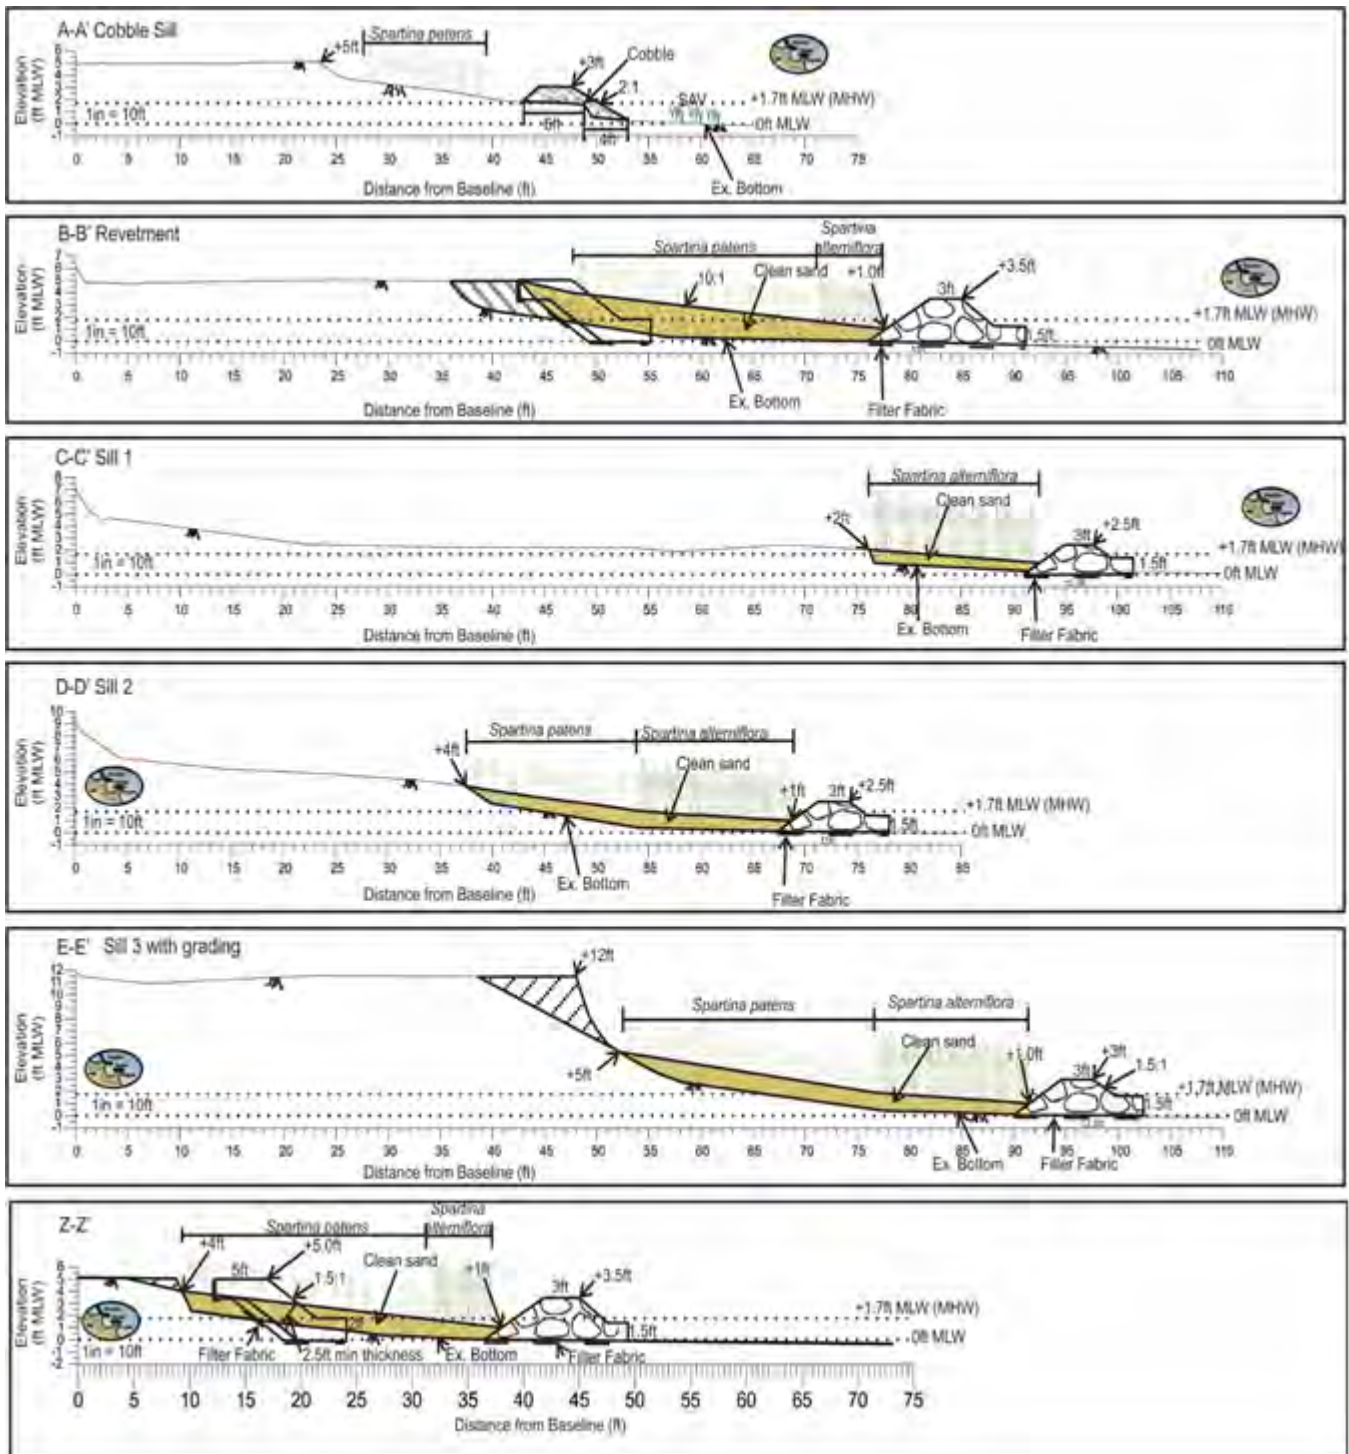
Typical cross-section of shore protection structures proposed at Occhohannock on the Bay.
